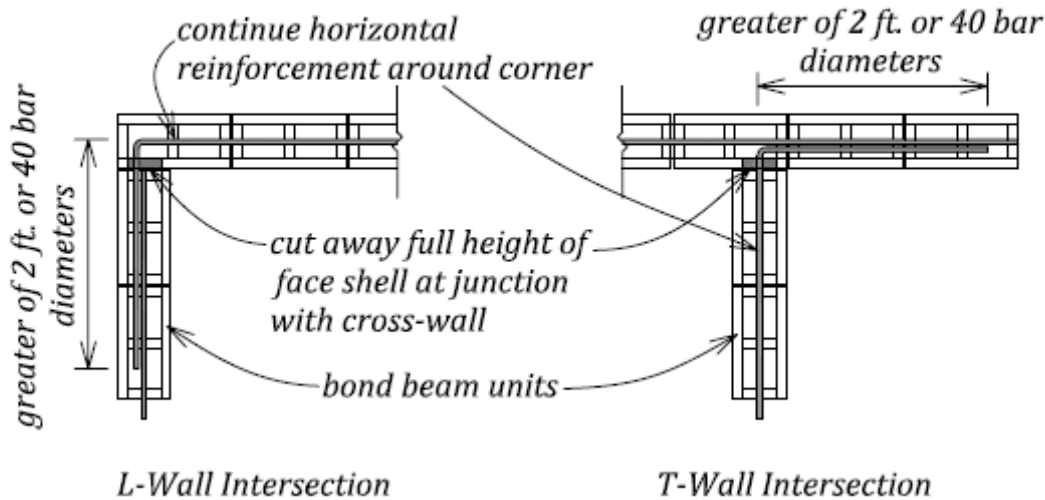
Horizontal reinforcement at the web-to-flange intersection: TCCMAR recommendations.
